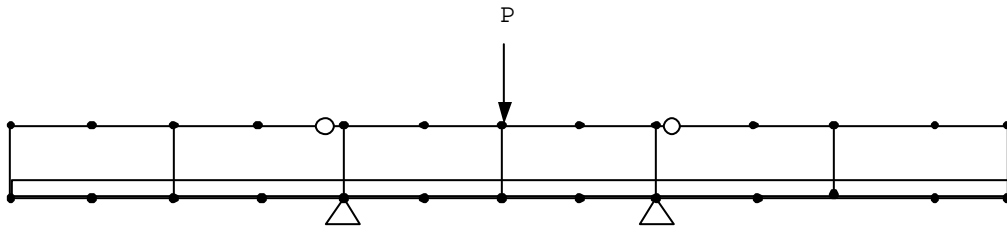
Illustration of 3-Span Bridge Chord, Rods are Frame Elements, 1-Point Load Beam Model
